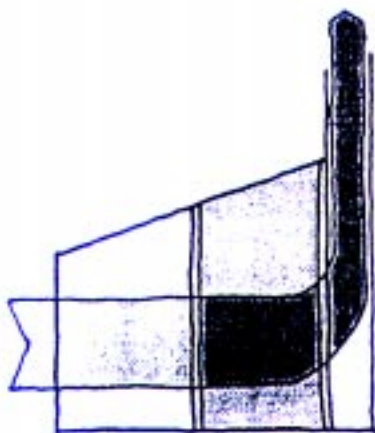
The chimney used as spatial element: zoned house in plan and section with tall chimney placed along the roof's ridge.
